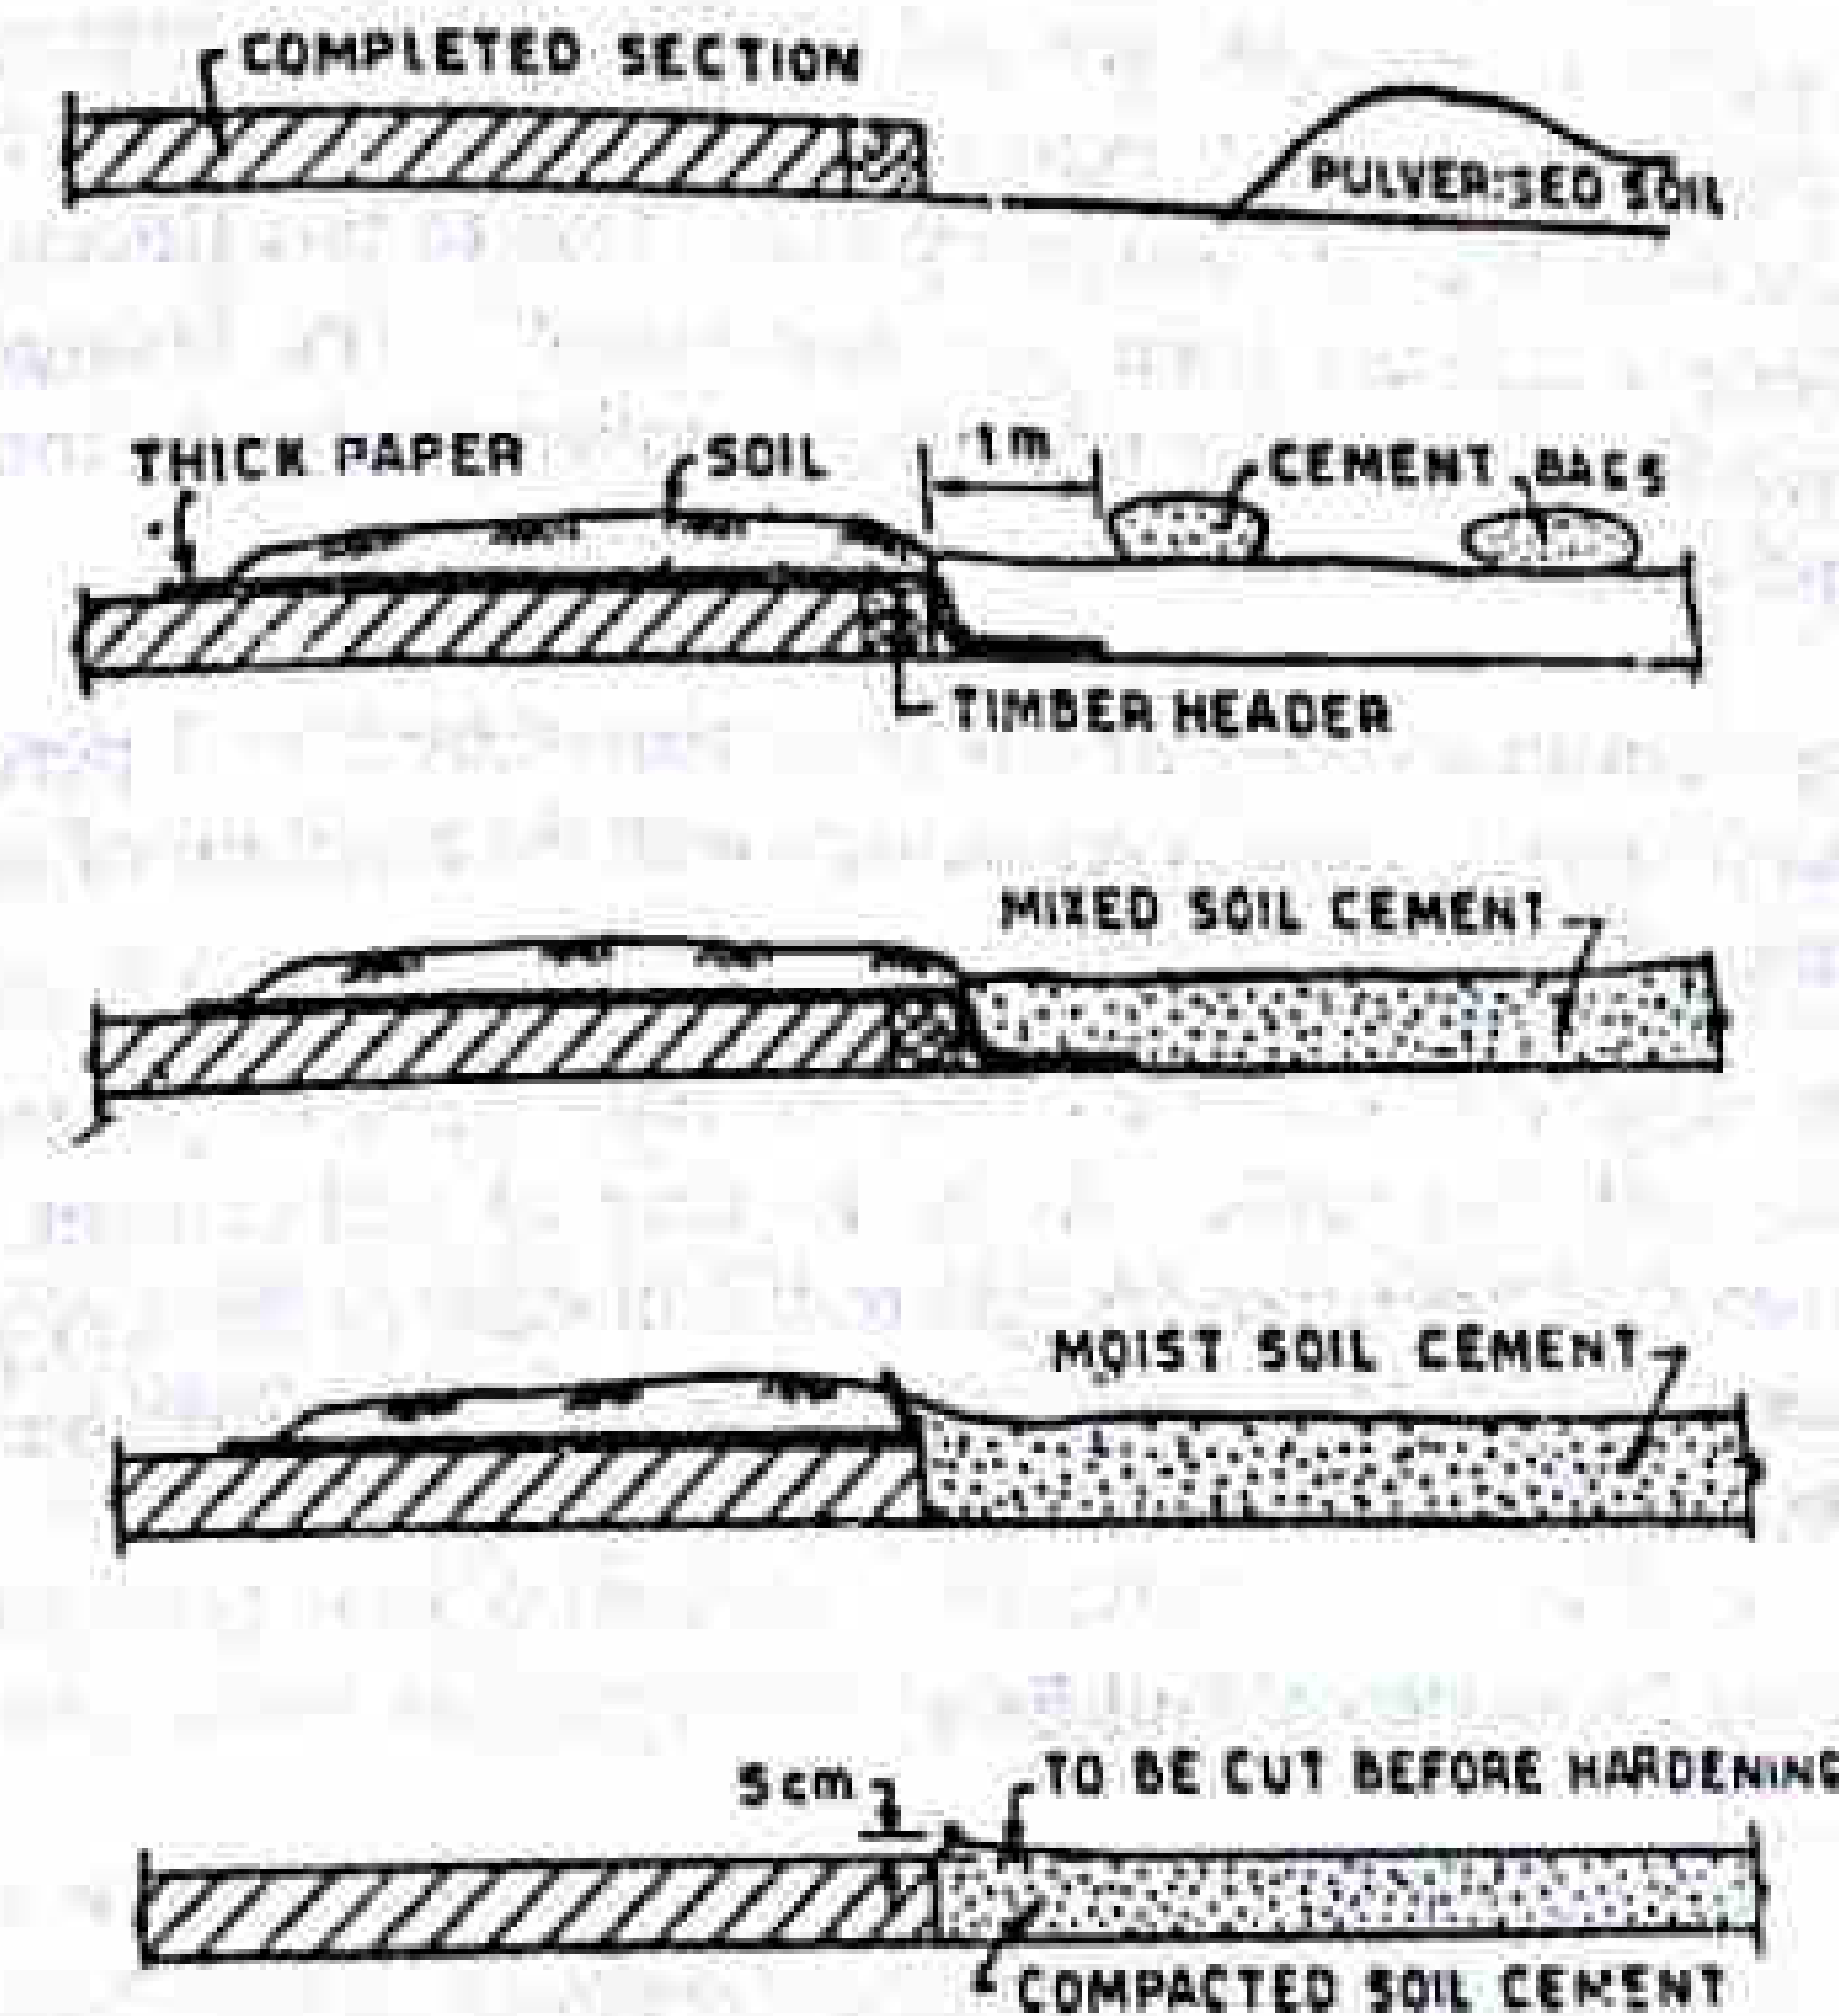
Protection of Joint in Soil-Cement Construction
